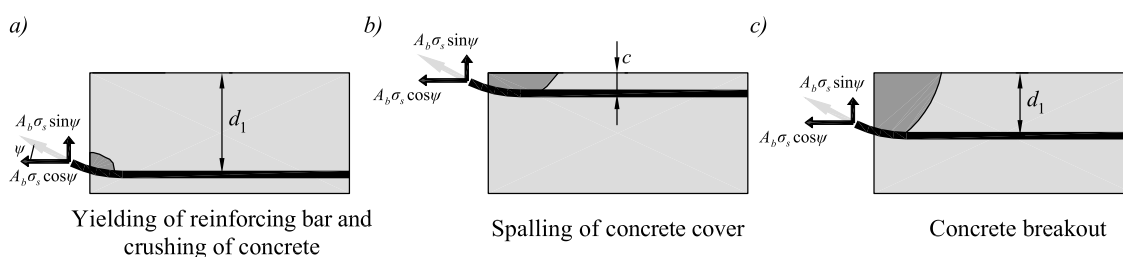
Modes of failure due to reinforcing bars acting against concrete
